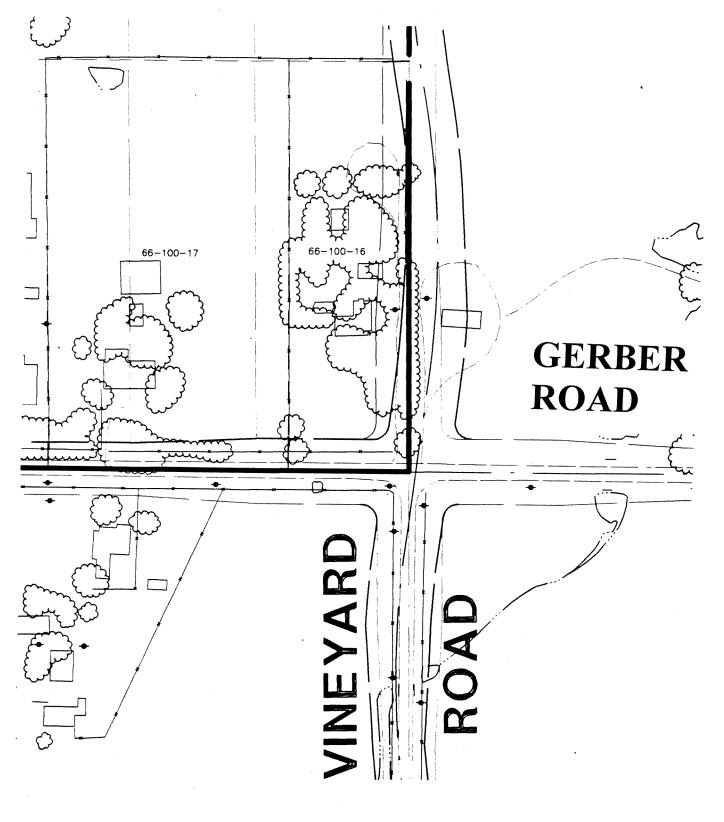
Conceptual Alignment Plan for the Extension of Vineyard Road
